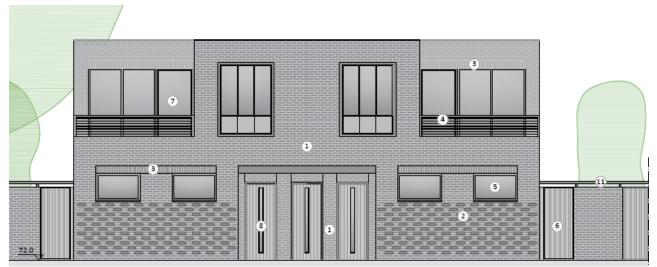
Refused front elevation of planning application 16/00018/FUL.
